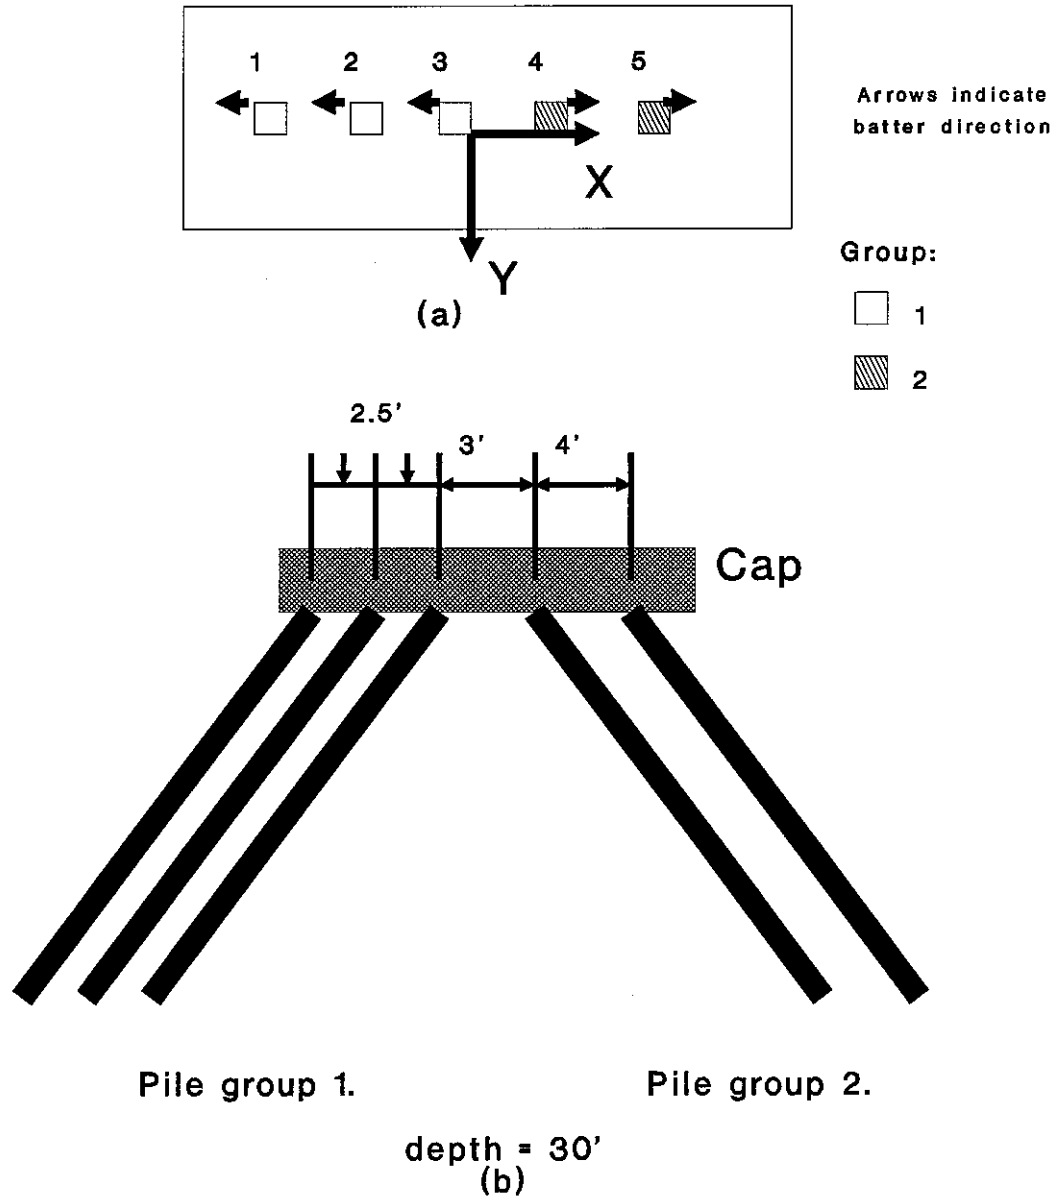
Initial pile layouts for examples 1., 1.1, 1.2, and 1.3. (a):Plan view, (b):Elevation.
